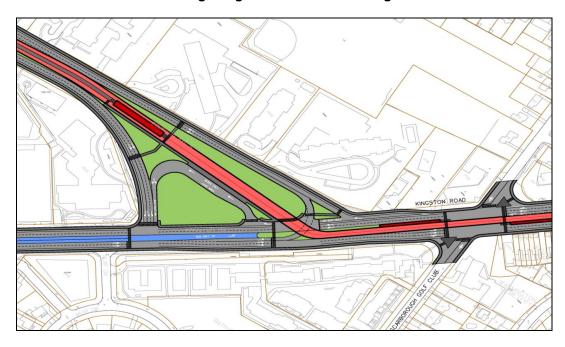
Preferred Design - Eglinton Avenue at Brimley Road and Danforth Road
